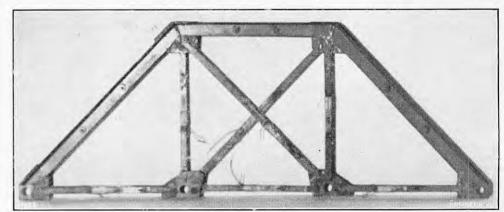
WELDED FRAME No. 6 TYPE (c).
